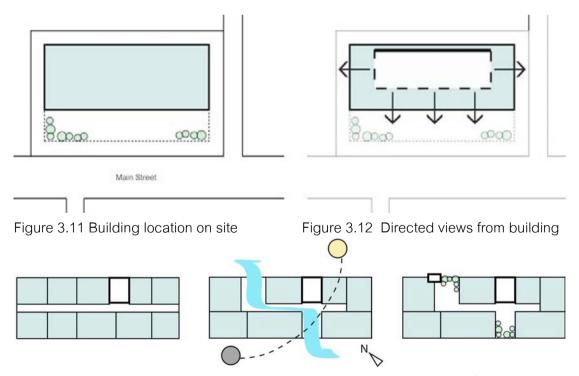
Maximized plan Figure 3.14 Naturally ventilated Figure 3.15 Common areas
